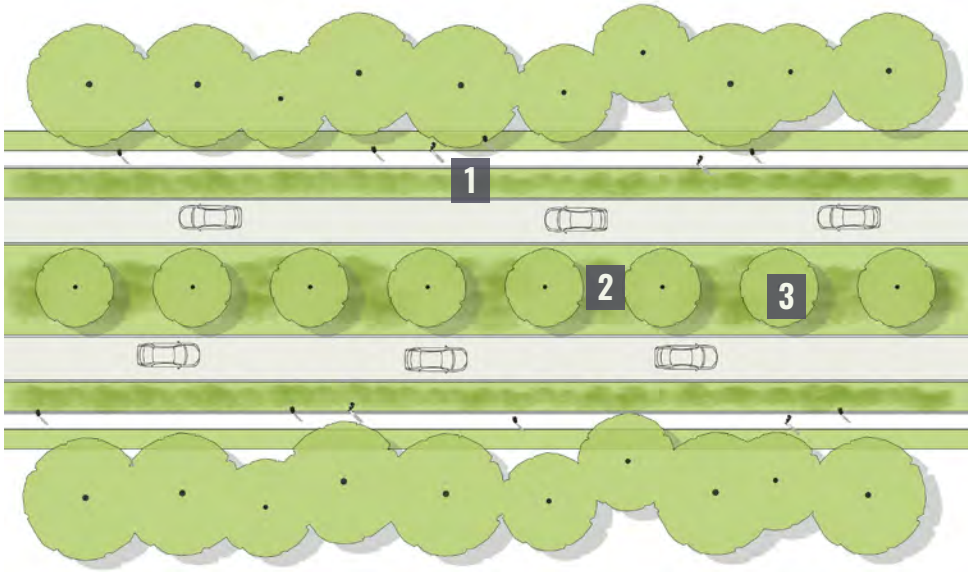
PLAN VIEW OF GREEN STREET RETROFITS ALONG DENNIS AVENUE
